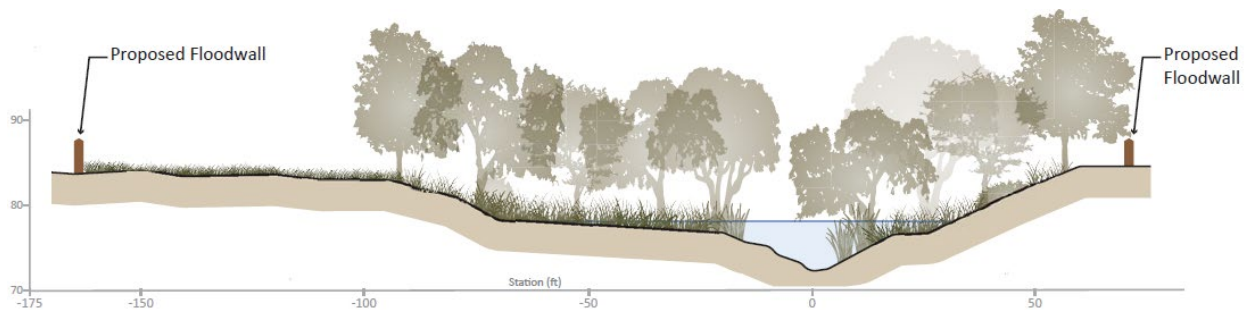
Reach 1 Proposed Floodwalls at Berryessa Station Way
